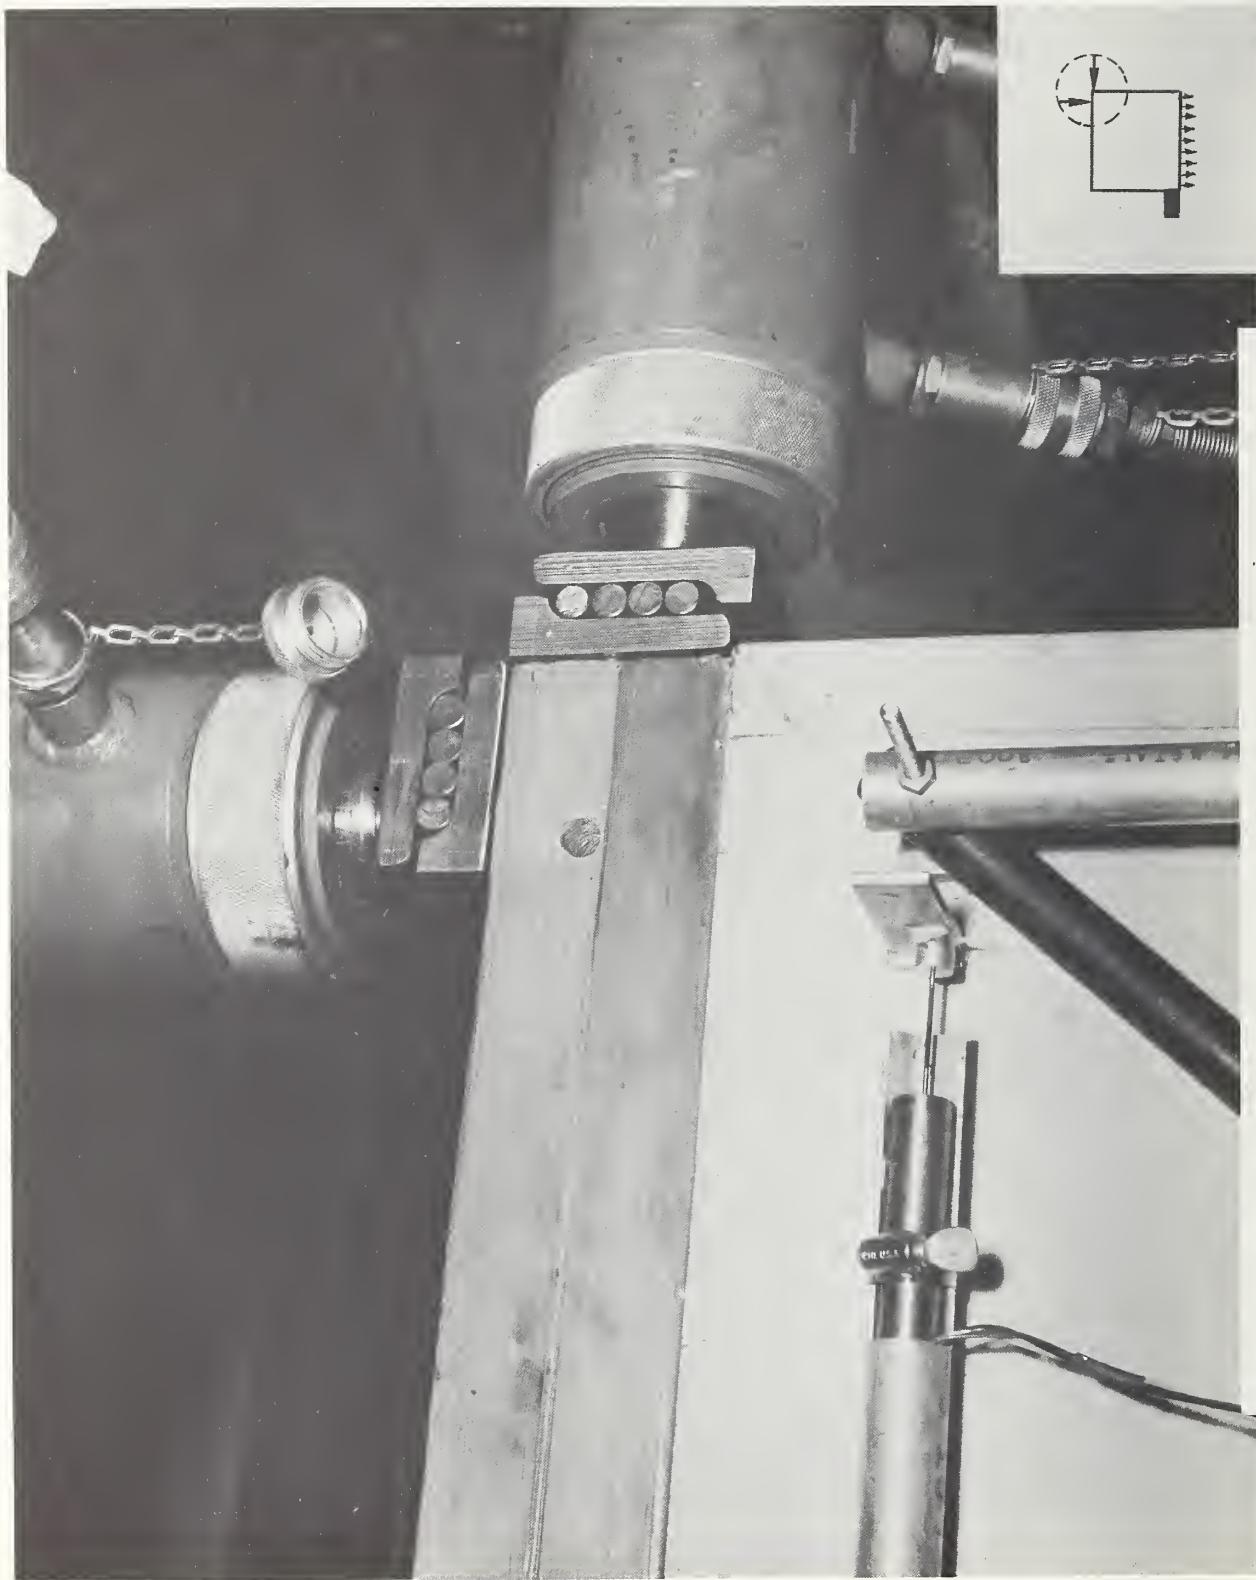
Detail of roller bearings and transducers used in racking tests.
